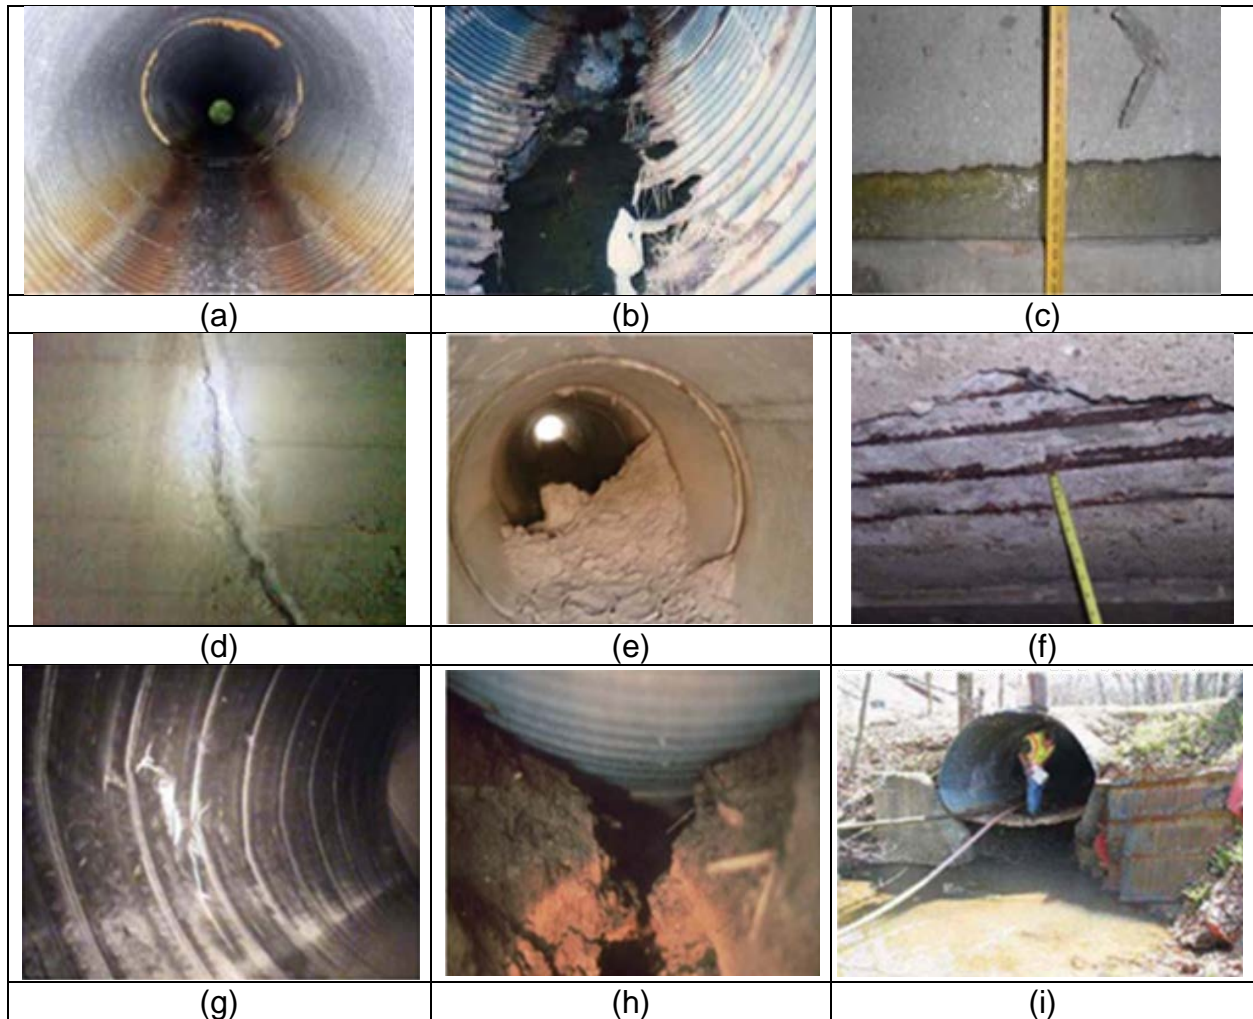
Common Defects of Culverts: (a) invert corrosion, (b) invert abrasion, (c) joint separation, (d) crack, (e) joint infiltration, (f) spalling in concrete culverts, (g) wall damages in plastic culverts, (h) piping beneath a culvert and (i) outlet scour (Piratla et al. 2017).
